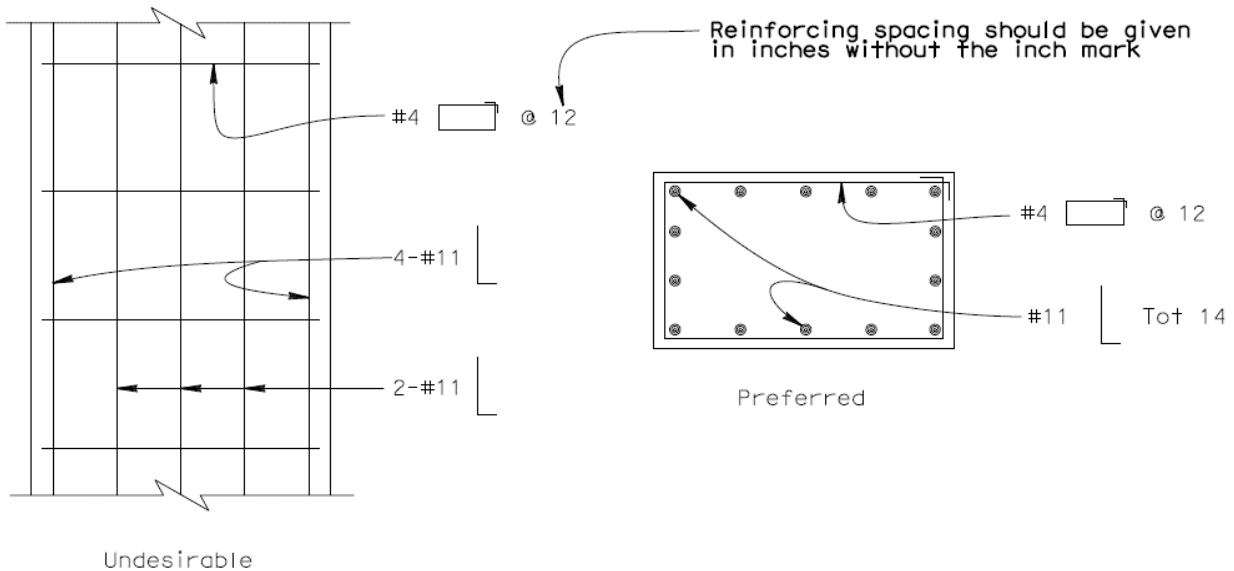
Reinforcement in vertical and horizontal planes
